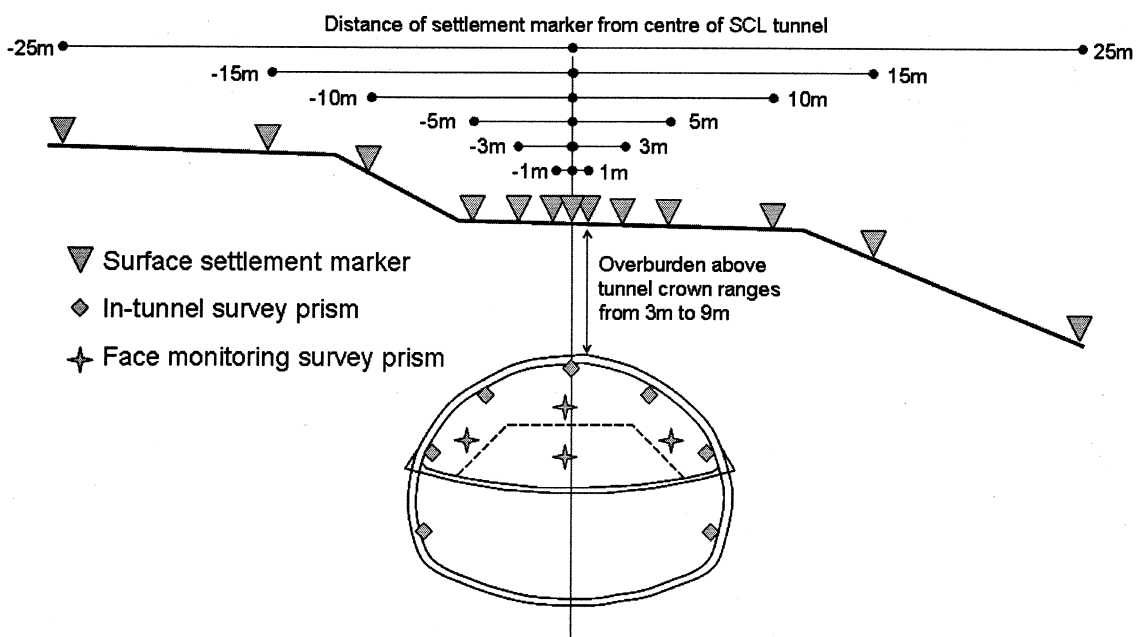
Typical surface settlement array and arrangement of in-tunnel deformation monitoring
